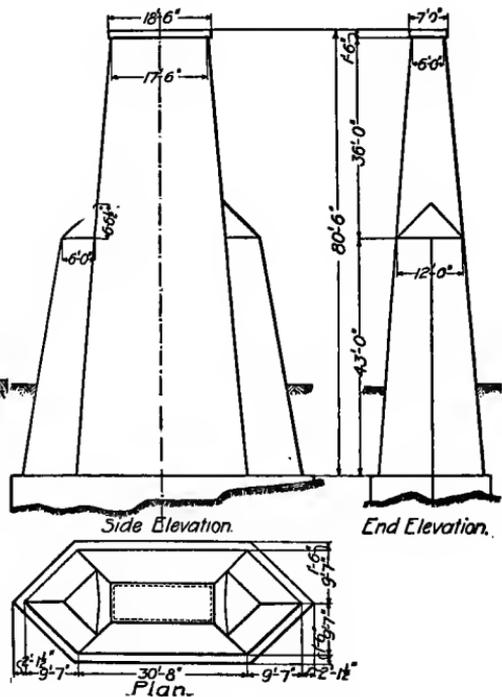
PLAIN-CONCRETE PIER. A. T. & S. F. R.R.
